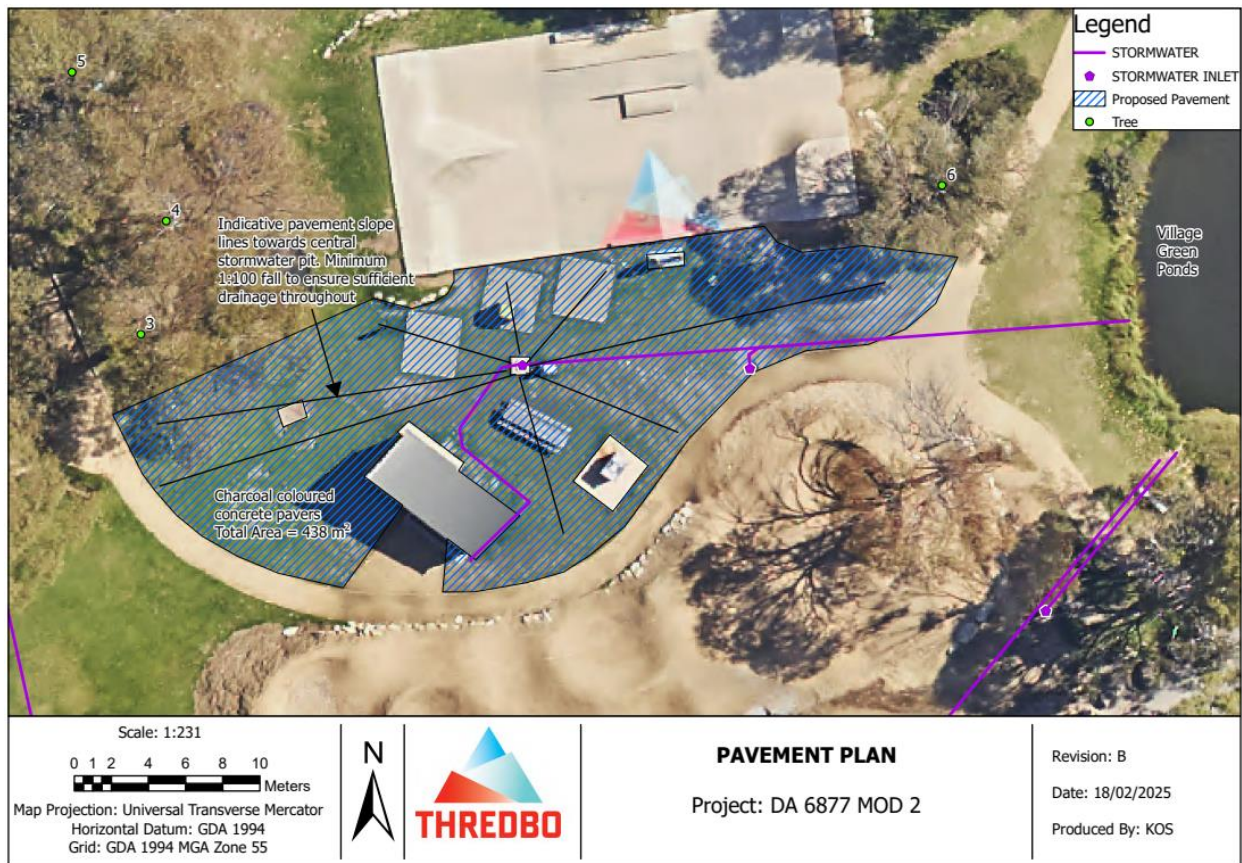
| Pavement Plan Rev B (Source: Applicant's documentation)
